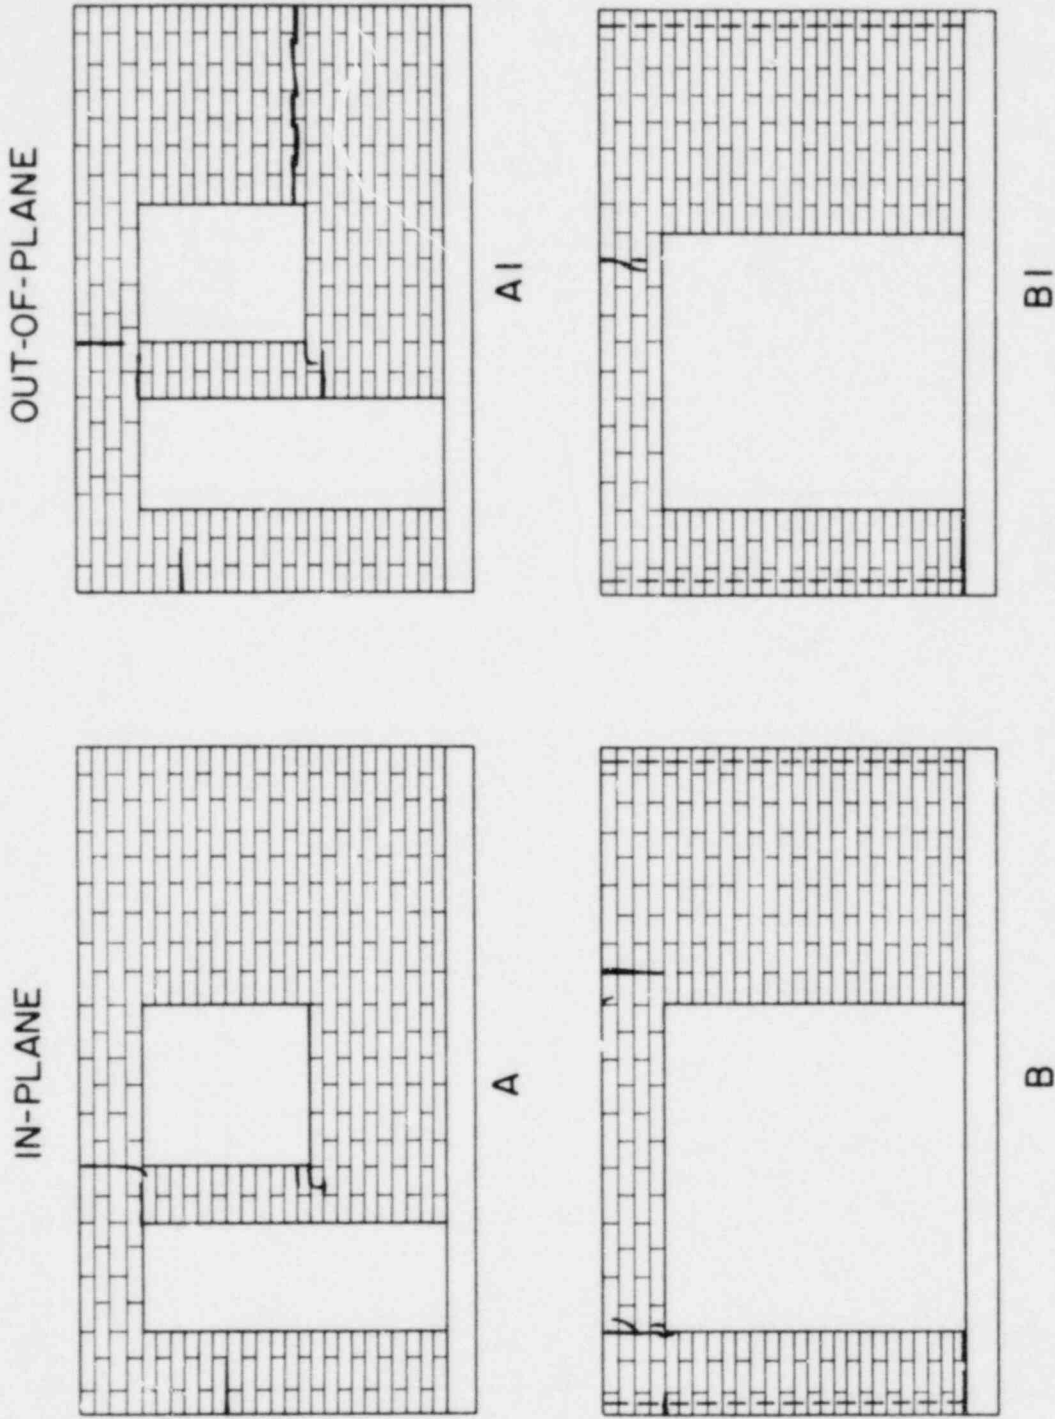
(c) DISTRIBUTION OF CRACKS IN THE MASONRY COMPONENTS; HOUSE 2, AFTER TEST 15
